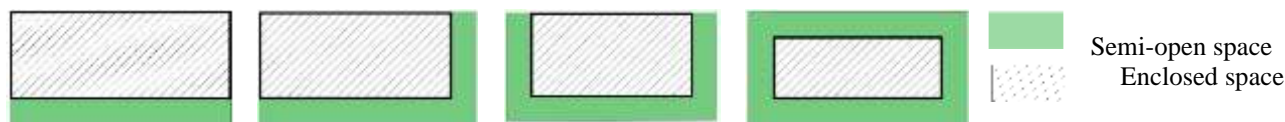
Examples of acceptable combinations of open and semi-open spaces in floor plans
